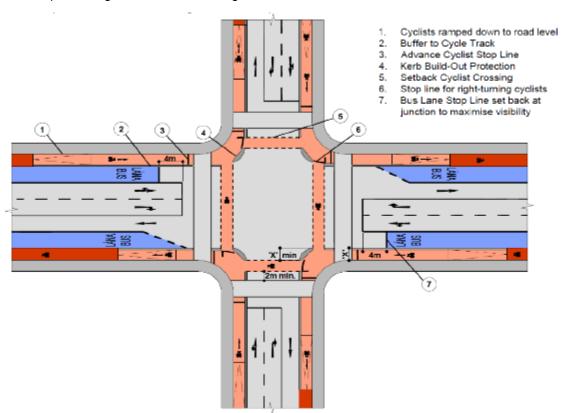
Typical Junction Layout from BusConnects Design Guidance Booklet
